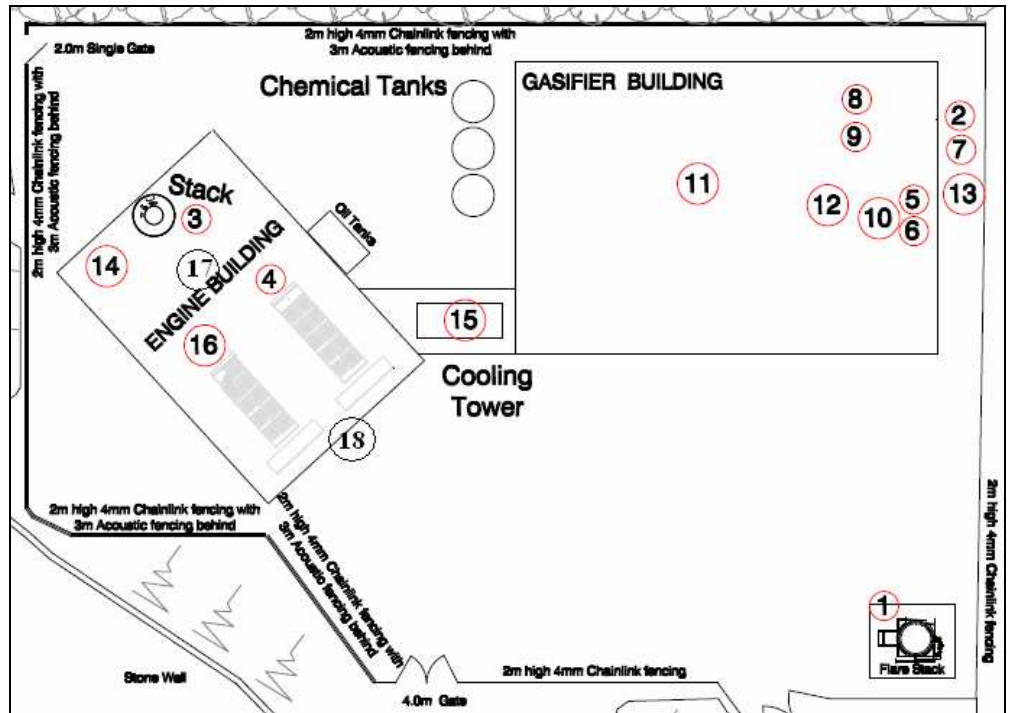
PROPOSED SITE LAYOUT & PROPOSED PLANT LOCATIONS
